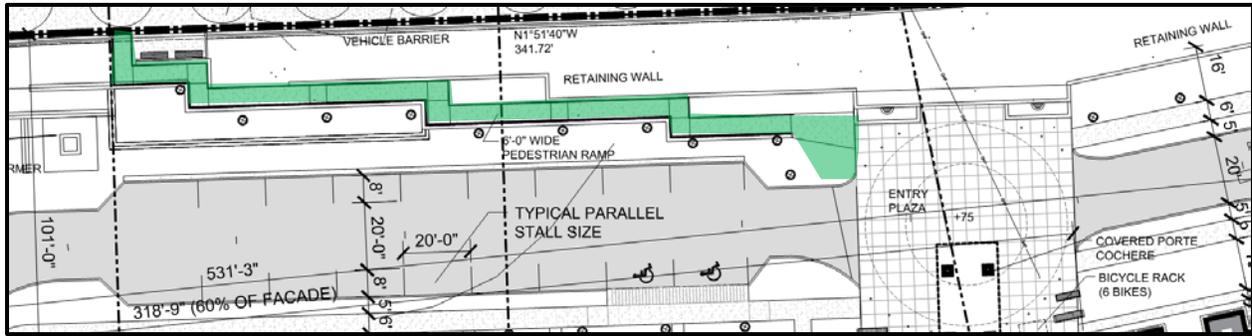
Sidewalk Ramp (green) at South Section of Neighborhood Street
